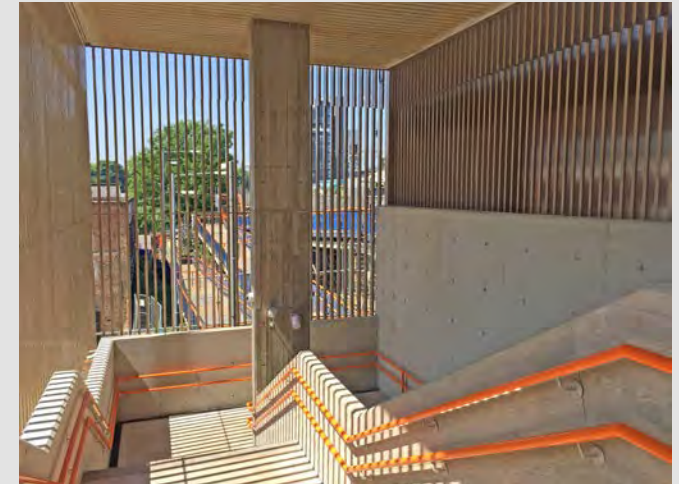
Hackney Wick station cast concrete stairs viewed from top and intermediate landings
